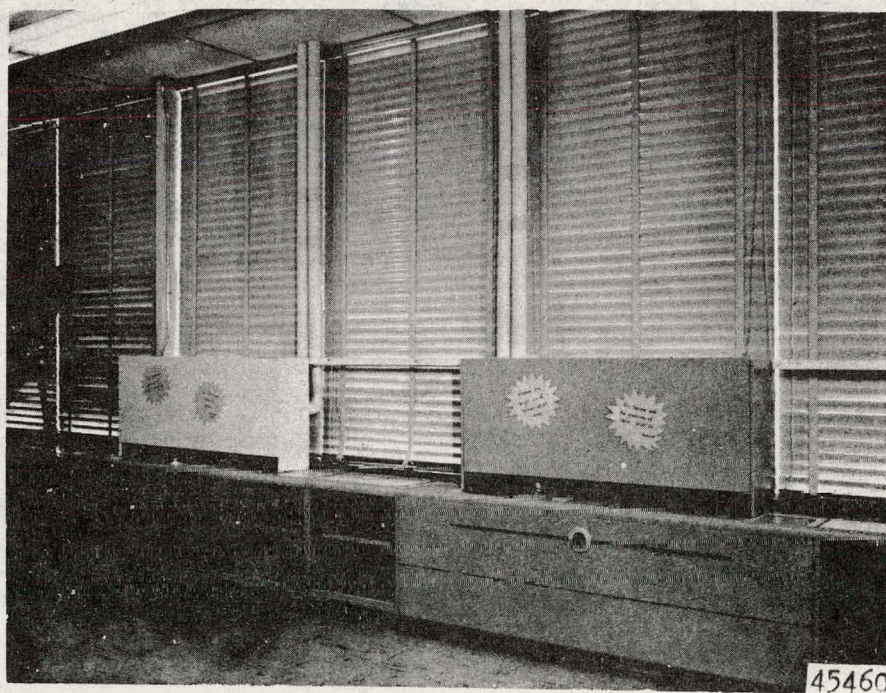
Two Hot Water Convectors Added to Typical Classroom to Provide Solar Heat
